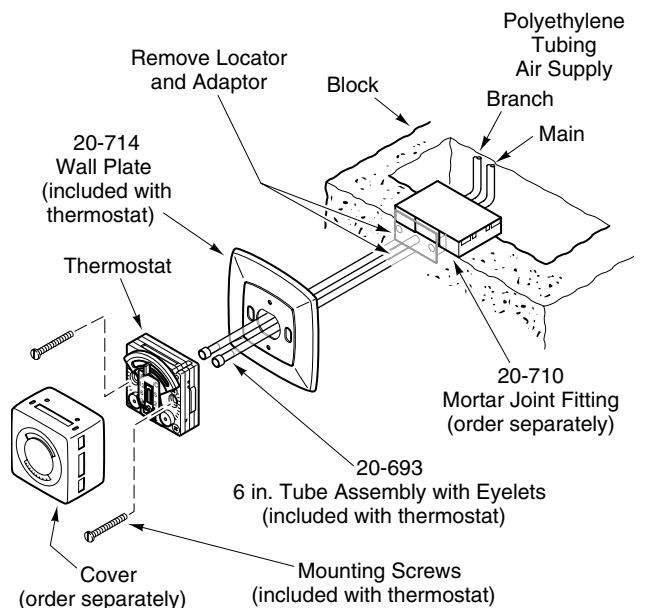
Thermostat Installation Using Pipehead in Masonry Wall.
